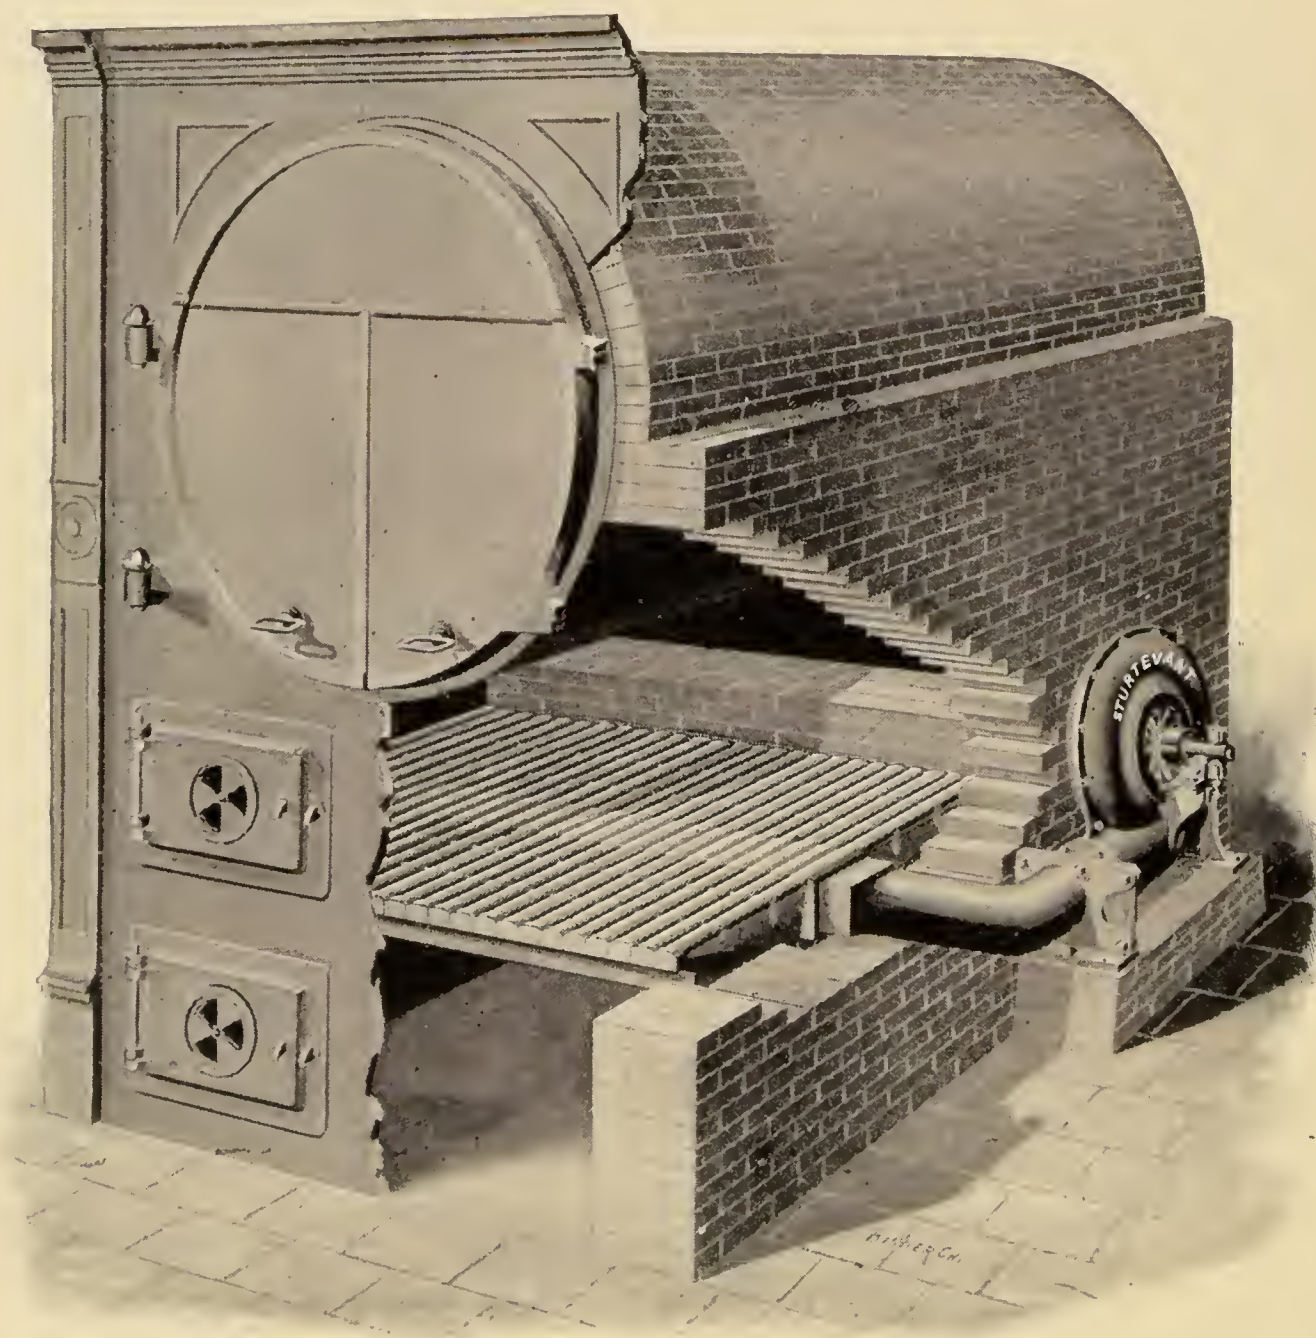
BOILER EQUIPPED WITH GADEY AIR GRATE AND STURTEVANT BLOWER.
